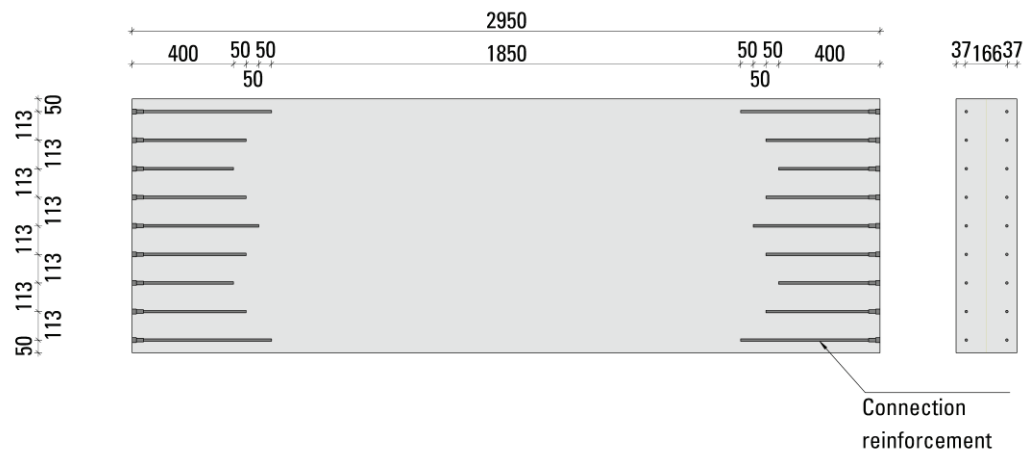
Specimen geometry and anchorage layout of the unreinforced specimens for test series 3
